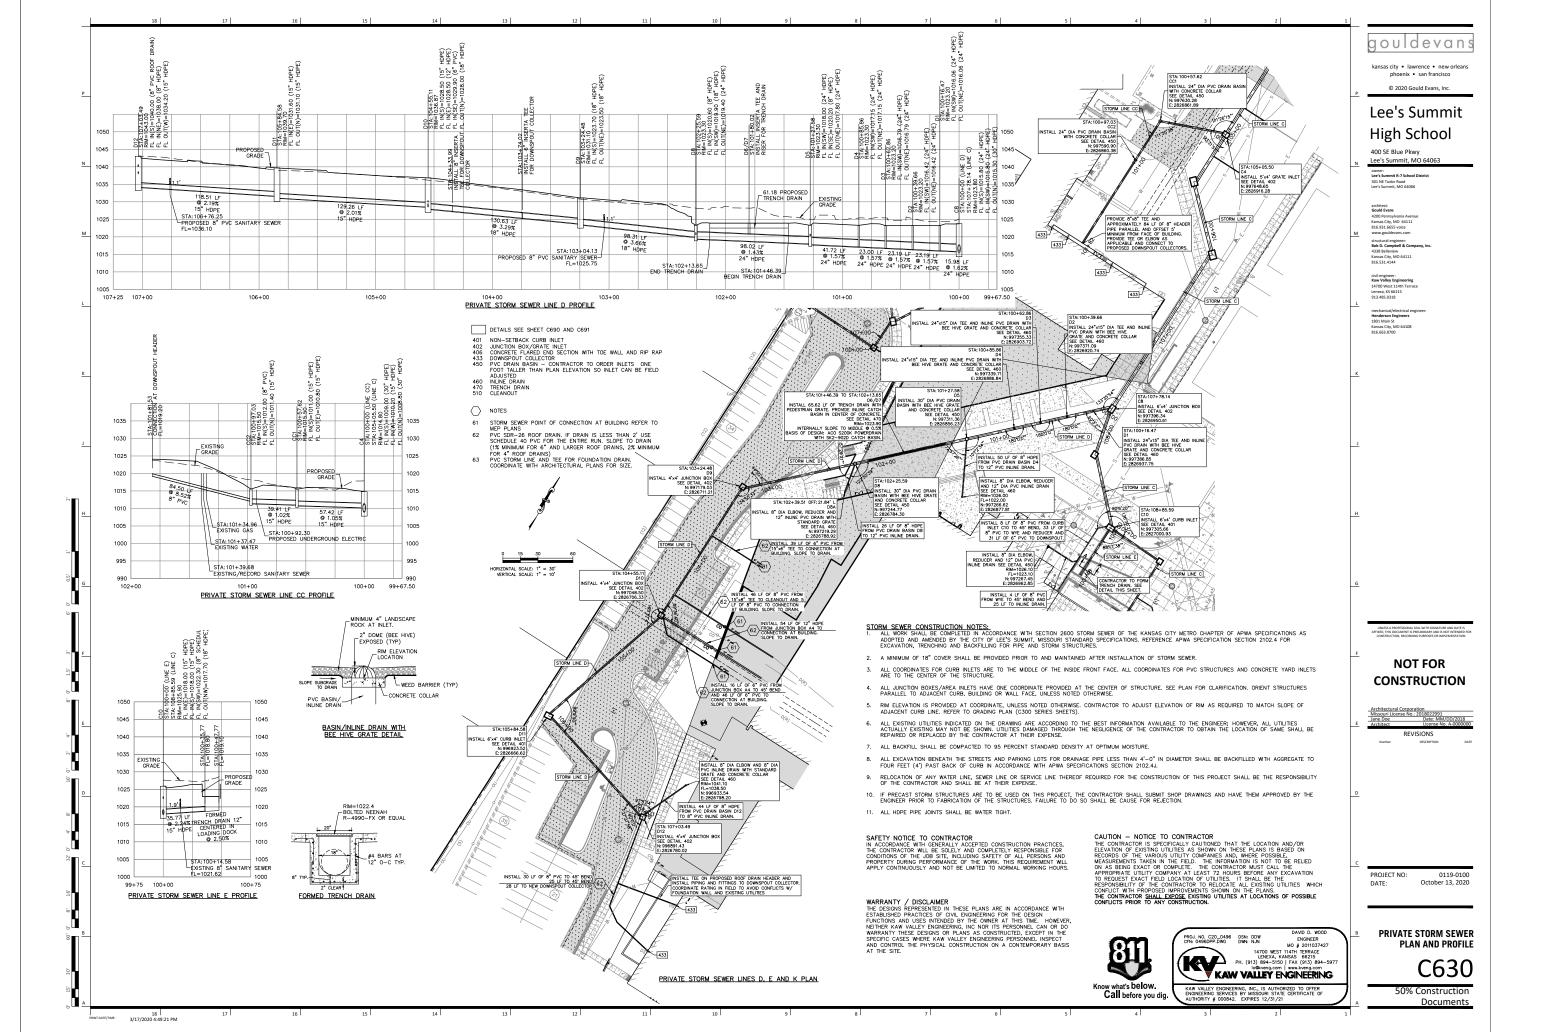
Exhibit C Drainage Area Map & Calculations Storm Sewer Plan and Profiles BMP Plan EDDB Calculations
